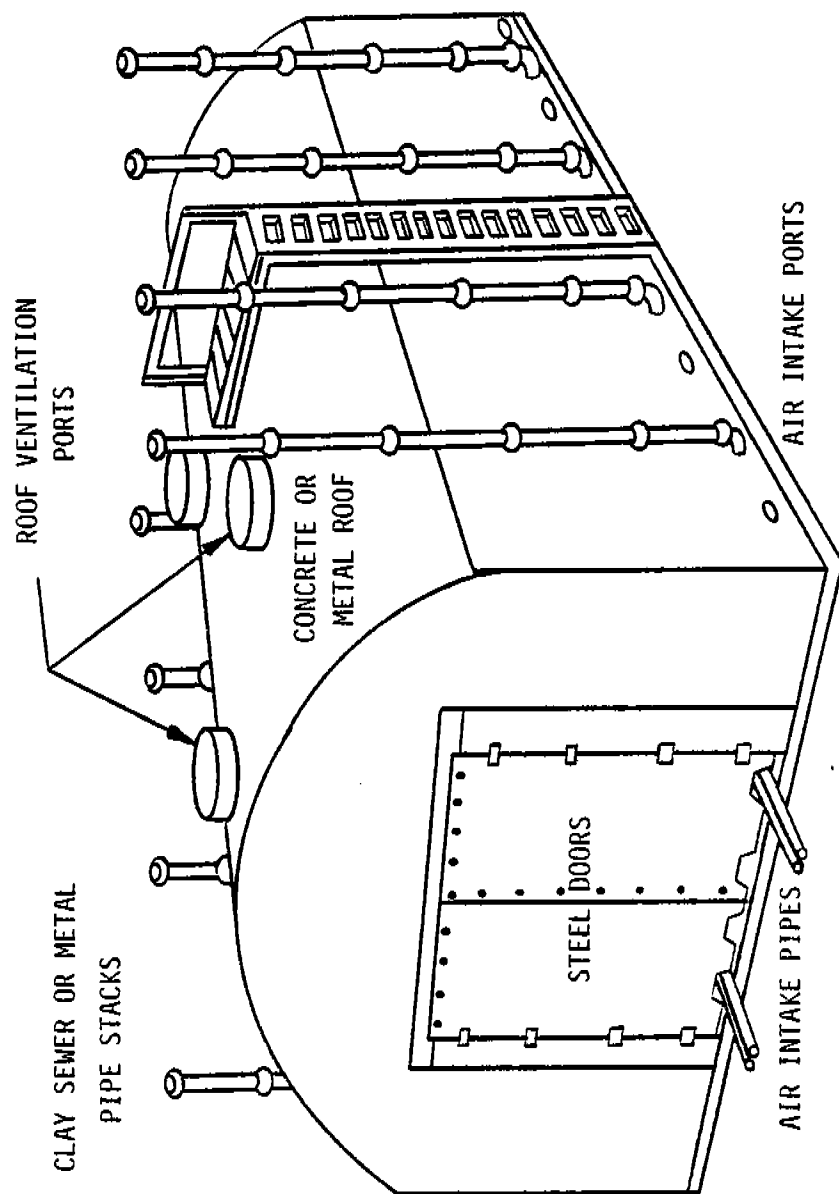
Typical Missouri-type charcoal kiln with multiple exhaust stacks.
